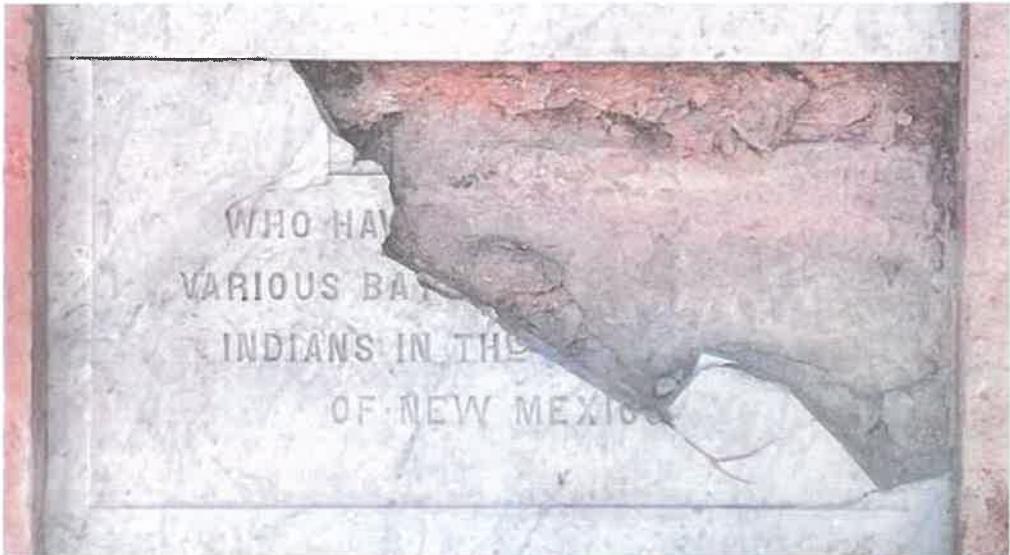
North elevation. Tablet. Camera facing south. March 16, 2025.
